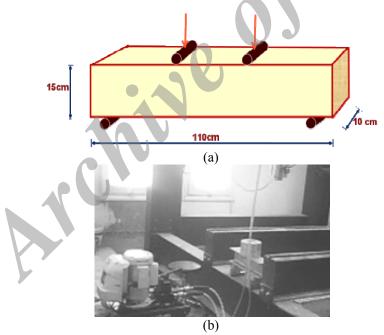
(a) Dimensions of the tested specimens, and (b) The loading frame
